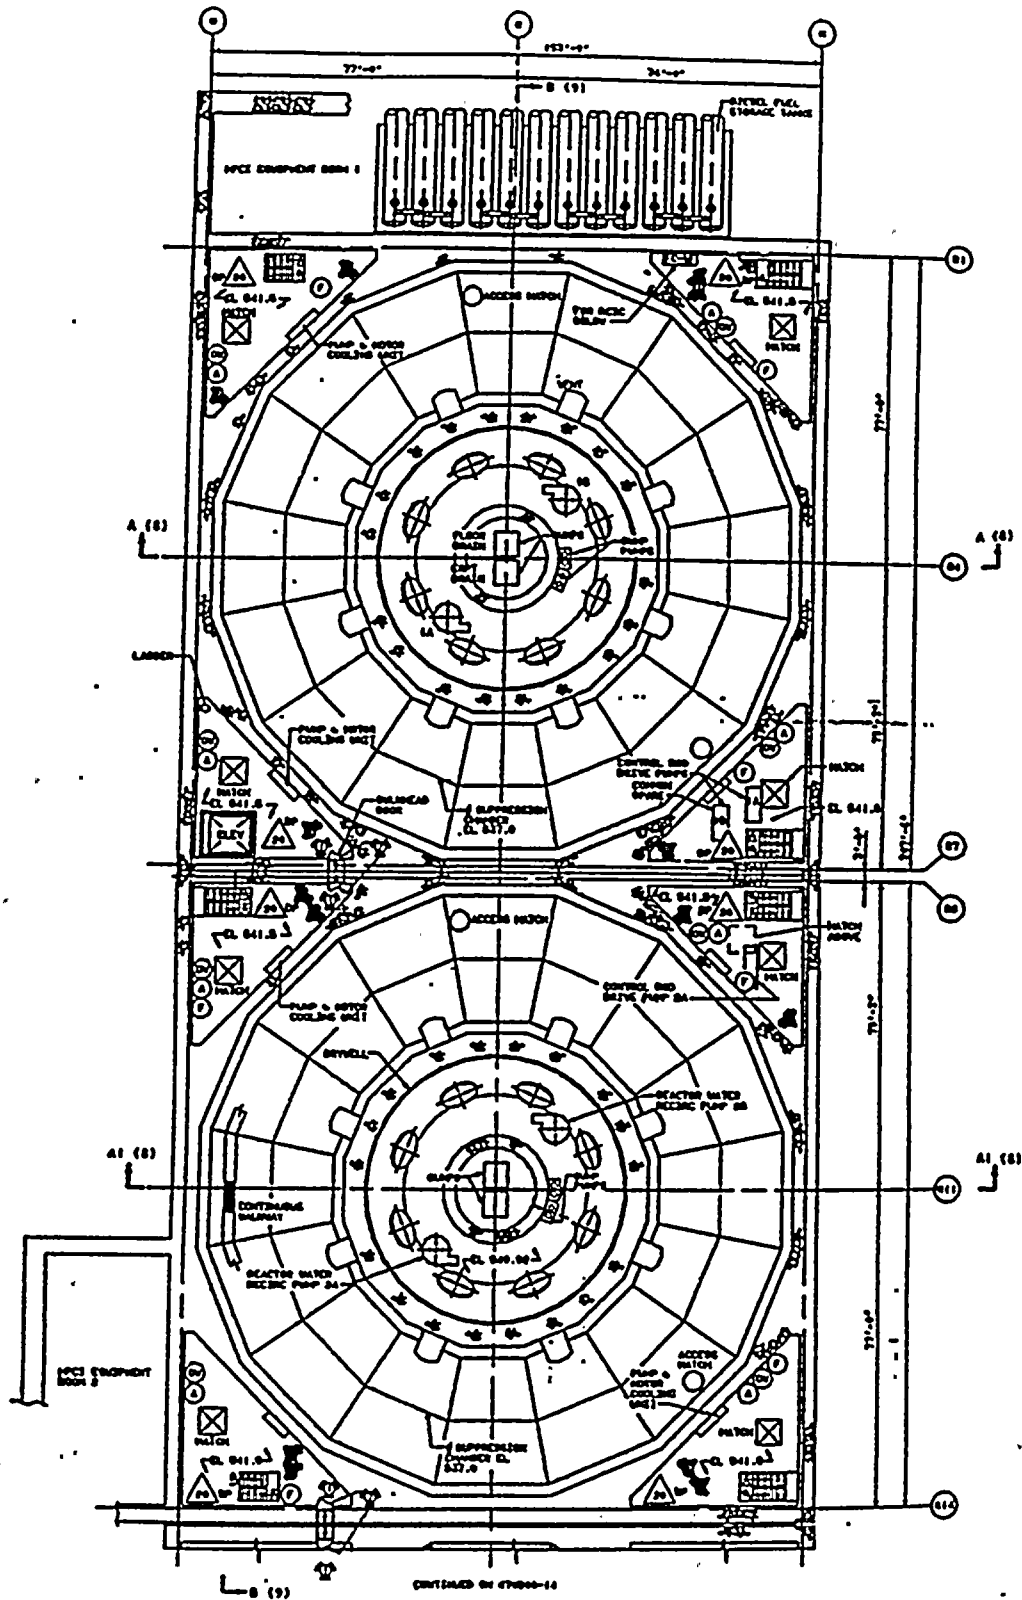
(Page 1 of 2). Reactor Building, Elevation 541'
